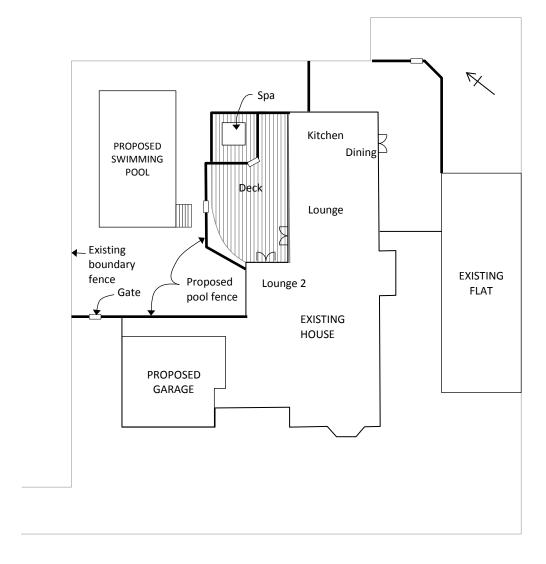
Site plan showing key features (based on approved pool plan drawing) (not to scale)
